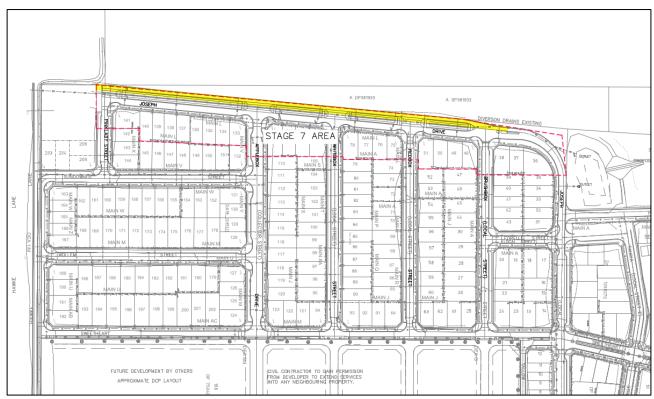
highlighted section of Joseph Drive showing the area in dispute
